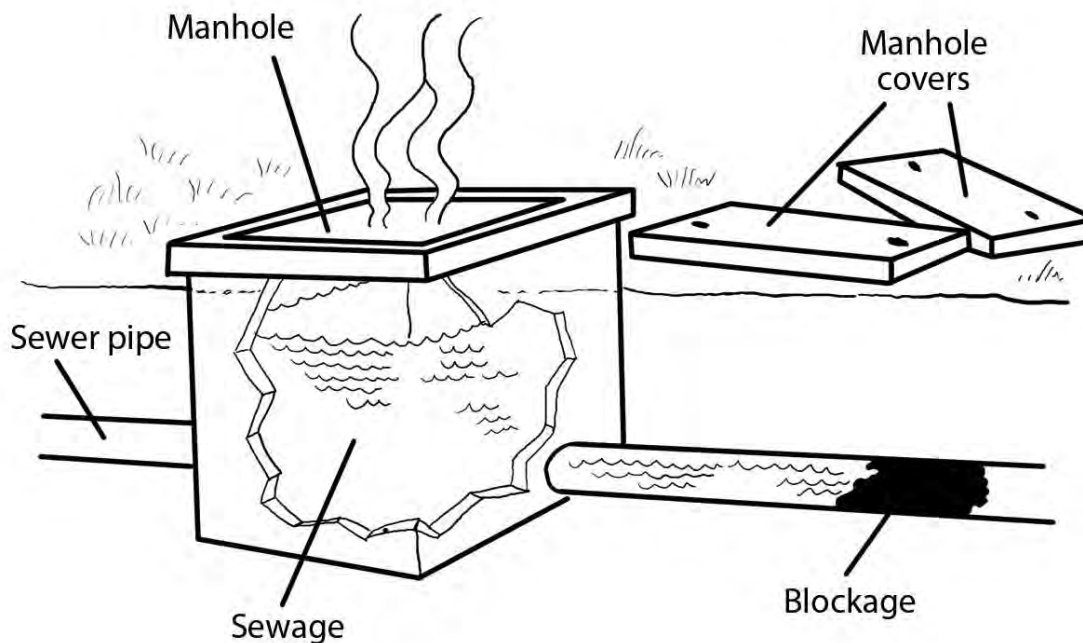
A blockage in the sewer pipe can cause the wastewater to build-up in the manhole.
